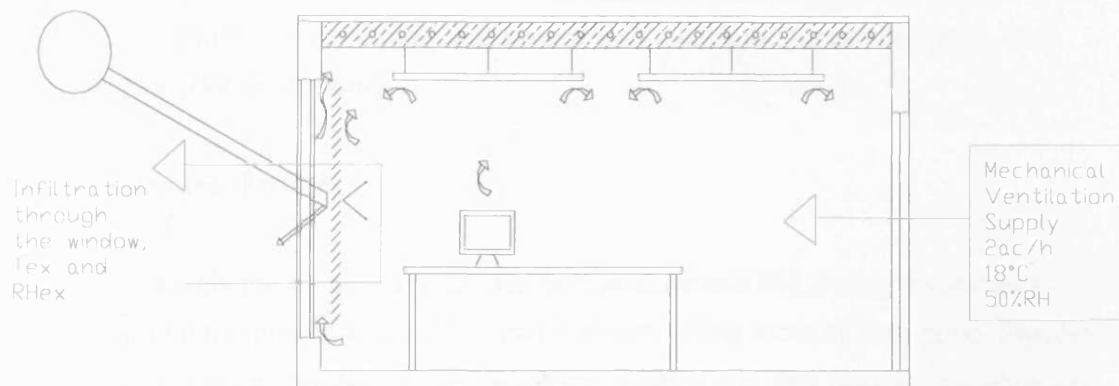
Case study application with cooling pipe network in structural concrete slab and ventilation supply
